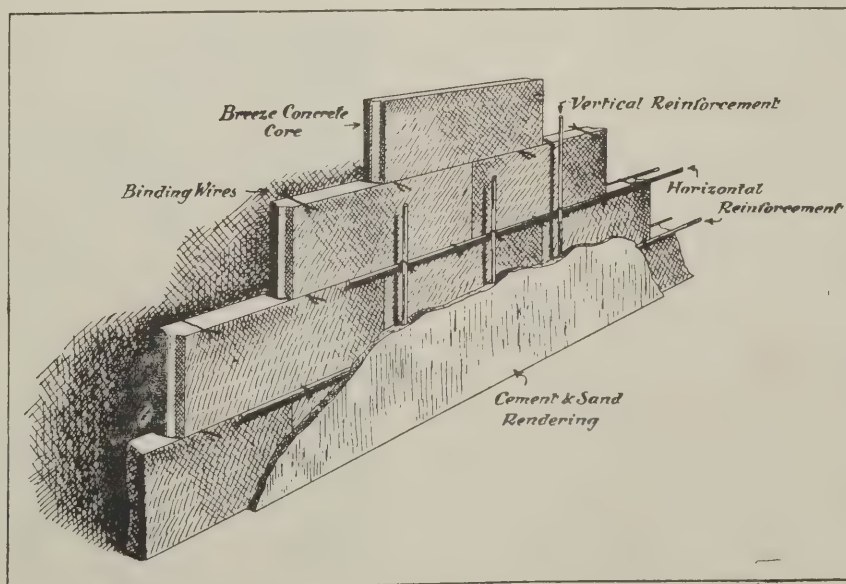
CONCRETE SLAB WALL WITH REINFORCEMENT.
